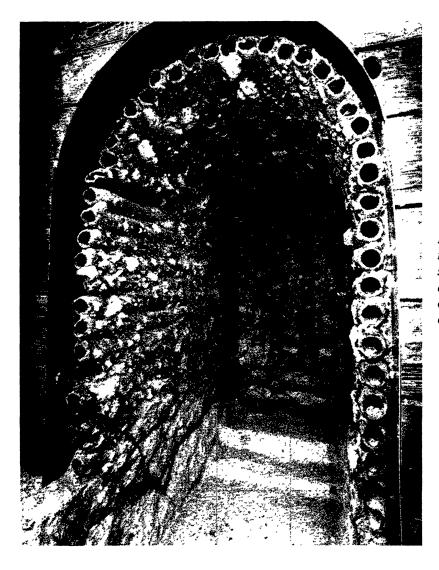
Photograph of prototype melted-in-place structure. Dimensions are 2 by 1 m at the opening, and 2 m deep. Interior rock and soil excavated after melting construction of arch and walls.
